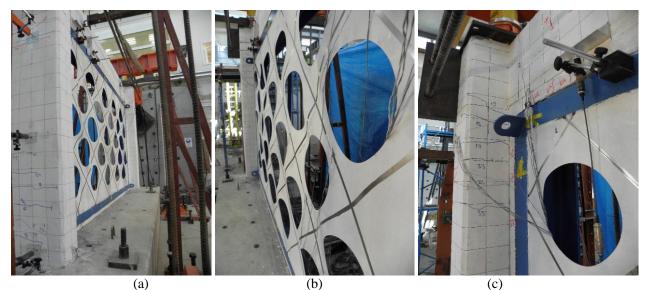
Damage in RSB specimen at retrofit target story drift angle (1/150) (a,b) Column-foundation connection regions (c) Beam-to-column connection region
